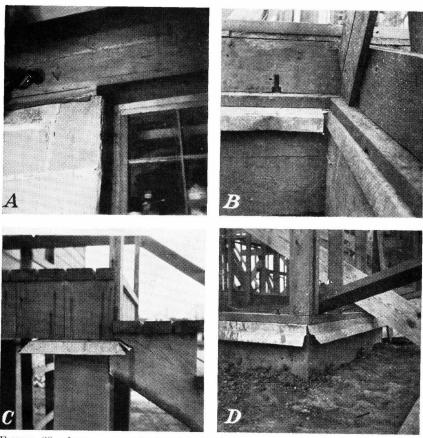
Improper methods of shielding. A, Shield not continuous over window, permitting attack through frame to sill: B, joint left open at corner, permitting termite passage; C, poor soldering, which allowed joint to open in handling; lack of clearance from wood around edge of shield nullifies shield's effectiveness; D, open joint at corner.
